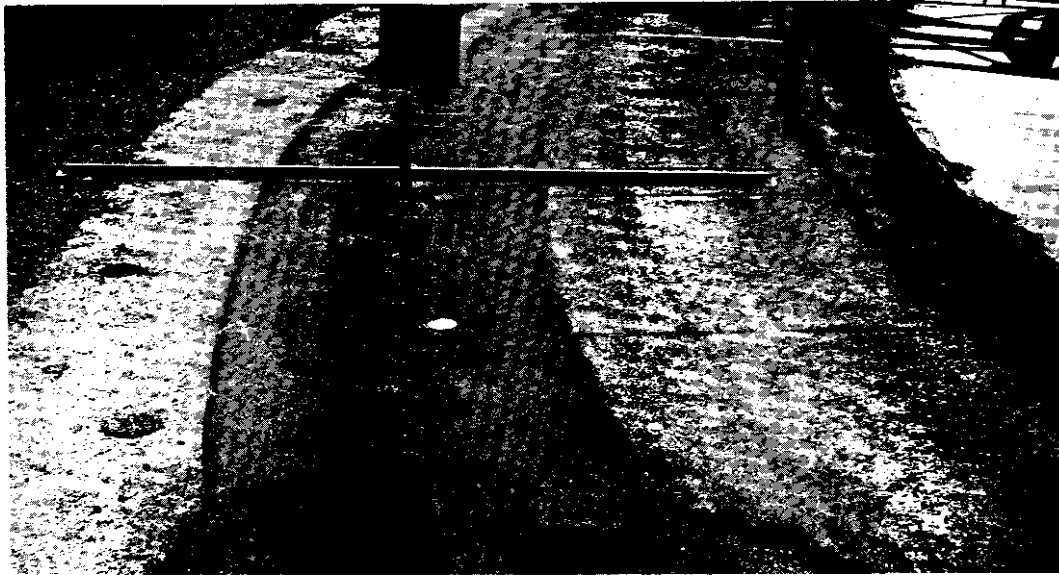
CONTINUED DETERIORATION OF SECTION 7 AT 170,700 WHEEL LOADS--JUNE 6, 1969. NOTE THE DEPTH OF RUTS AND THE CRACKS.
